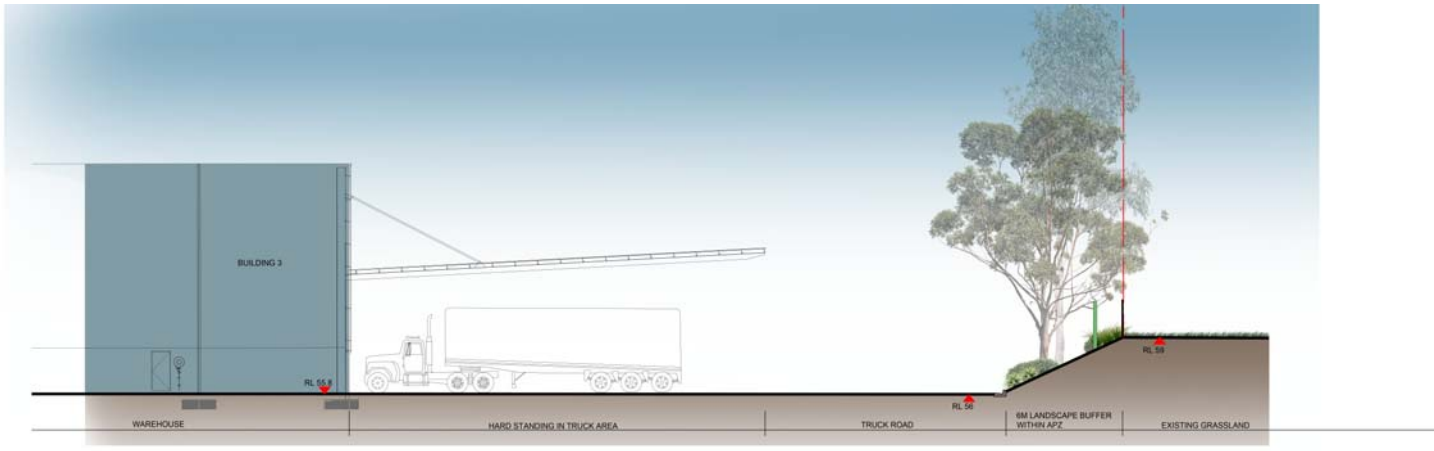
SECTION THROUGH SOUTHERN BOUNDARY (BUILDING 3)
